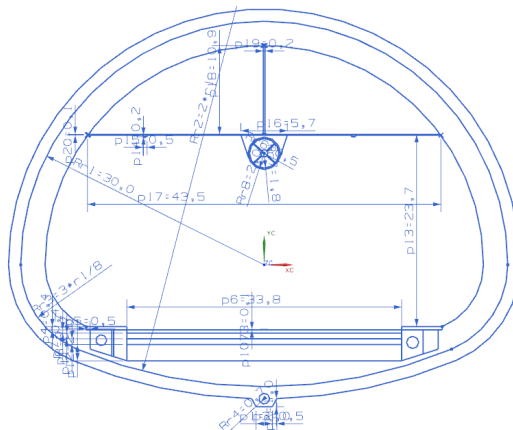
A complex parametric sketch defining the cross-section of a tunnel.
